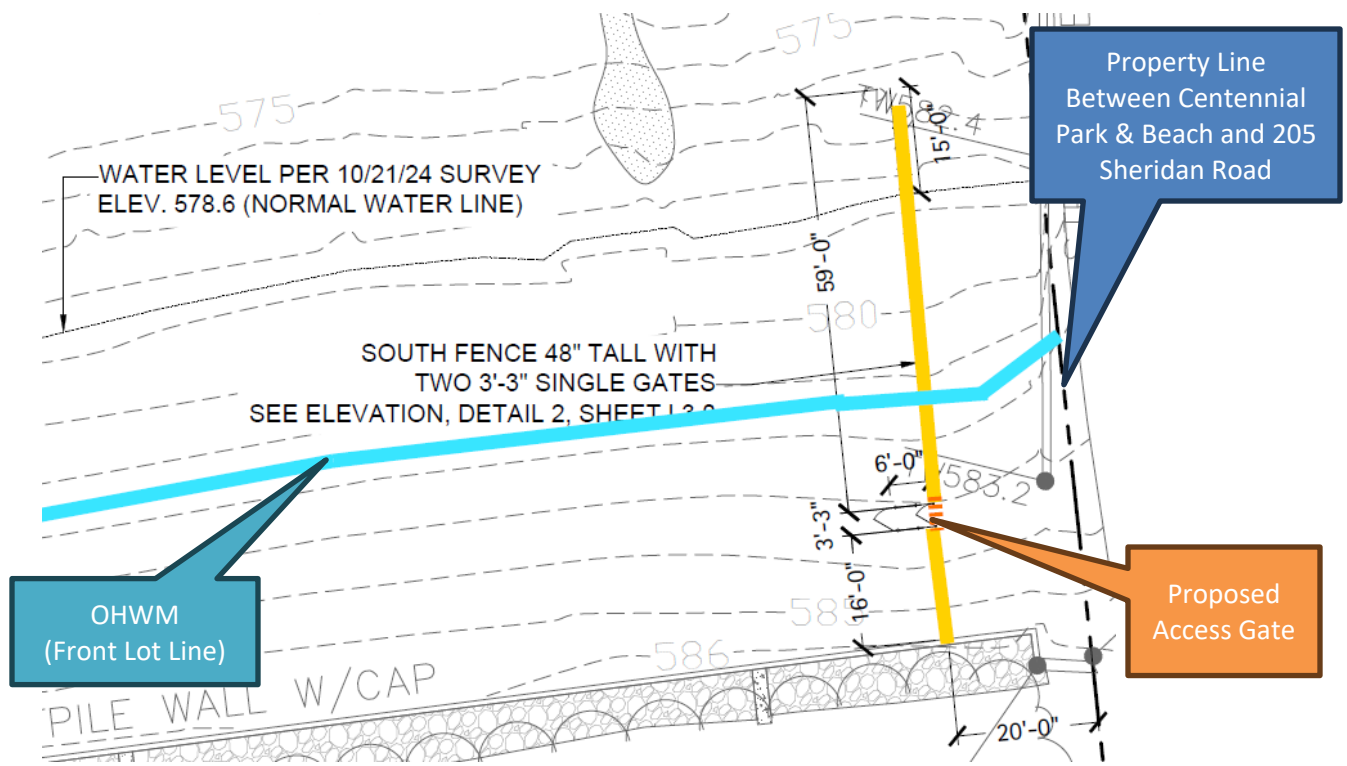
Proposed South Fence (Excerpt of Sheet L2.0)
